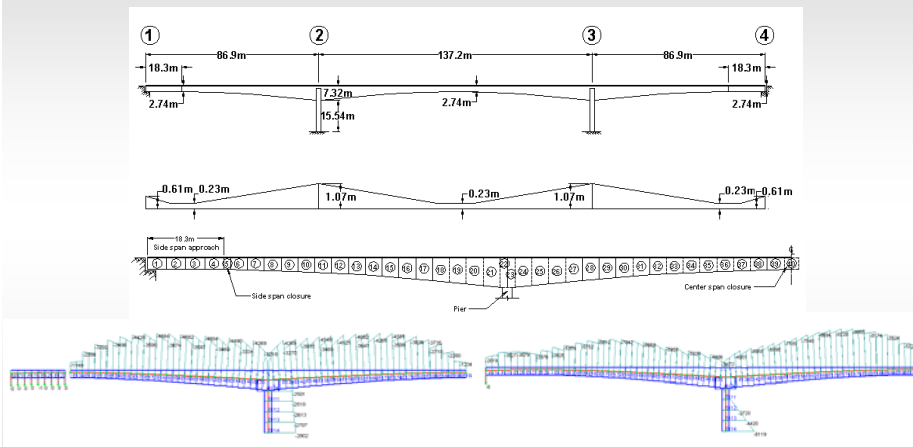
Bridge Elevation Profile, Bottom Slab Thickness Variation and Segment Division
